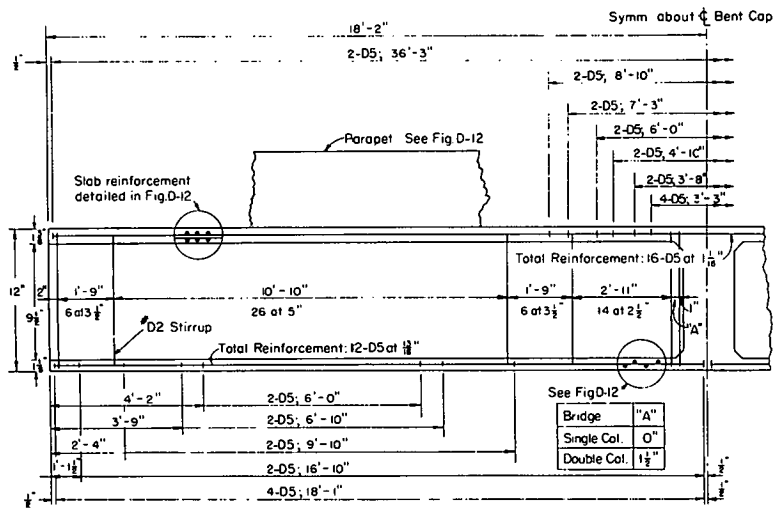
Exterior Girder Reinforcement for Model Bridges
